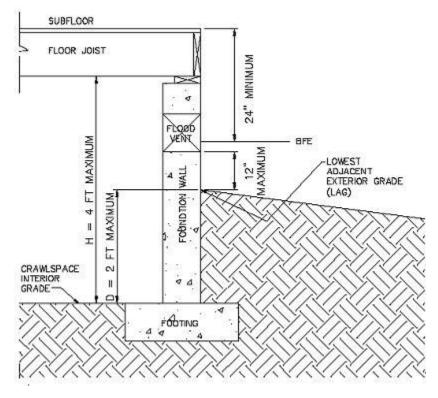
BELOW GRADE CRAWL SPACE CONSTRUCTION
